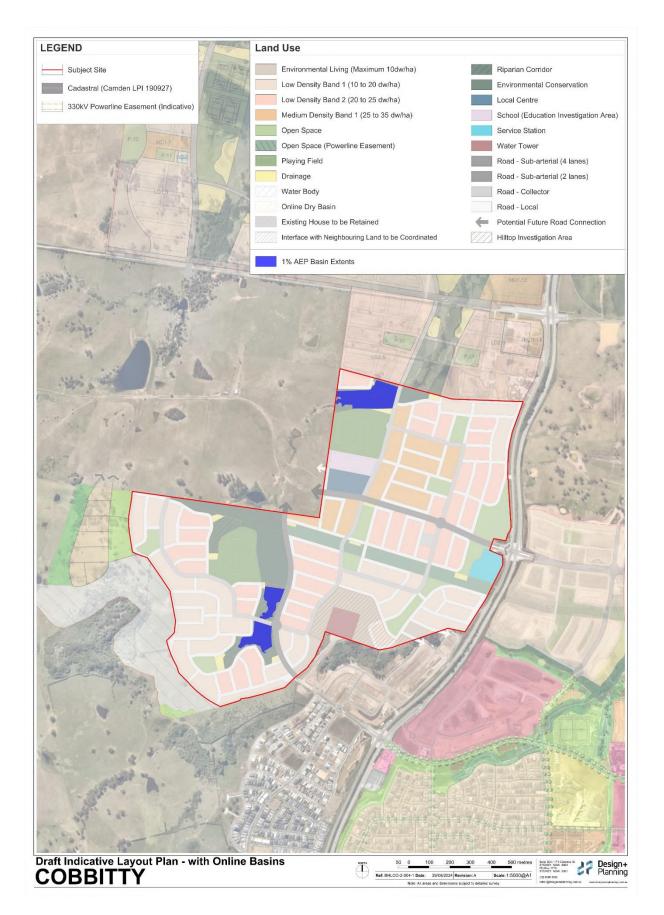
Indicative layout plan within online basins and riparian corridor (Design and Planning, Revision A)
